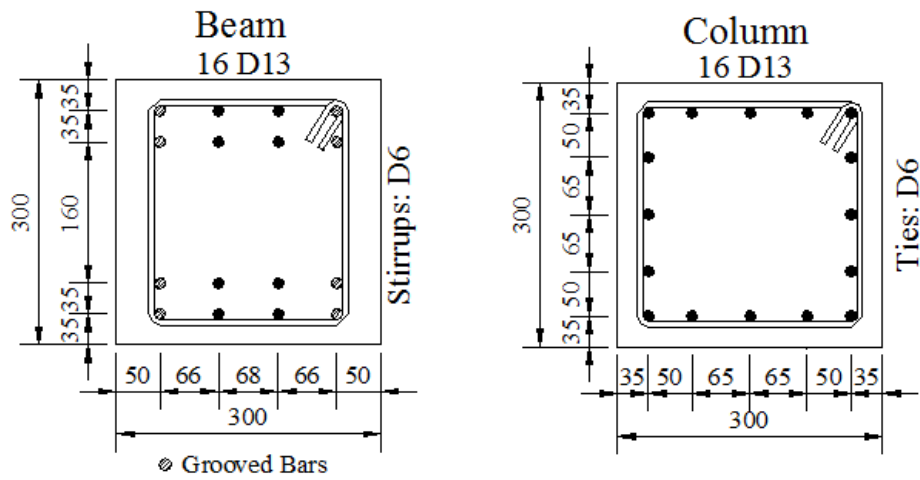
Cross Section Details of Subassemblies A2 and A3
